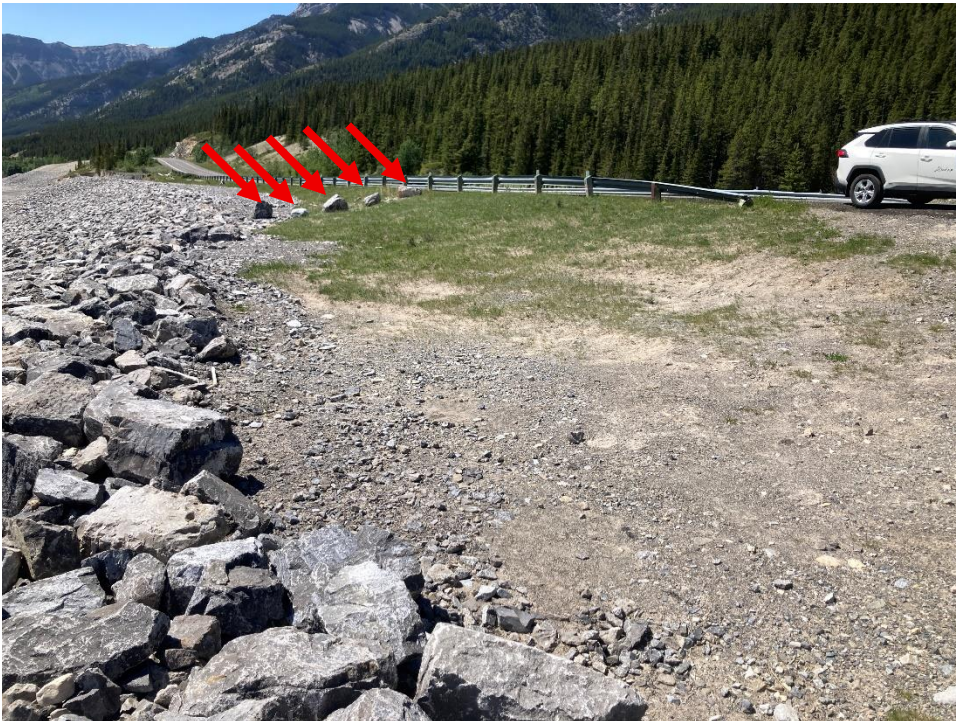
Pedestrian trail down to the west shoreline of Abraham Lake east of the C034-3 site.
